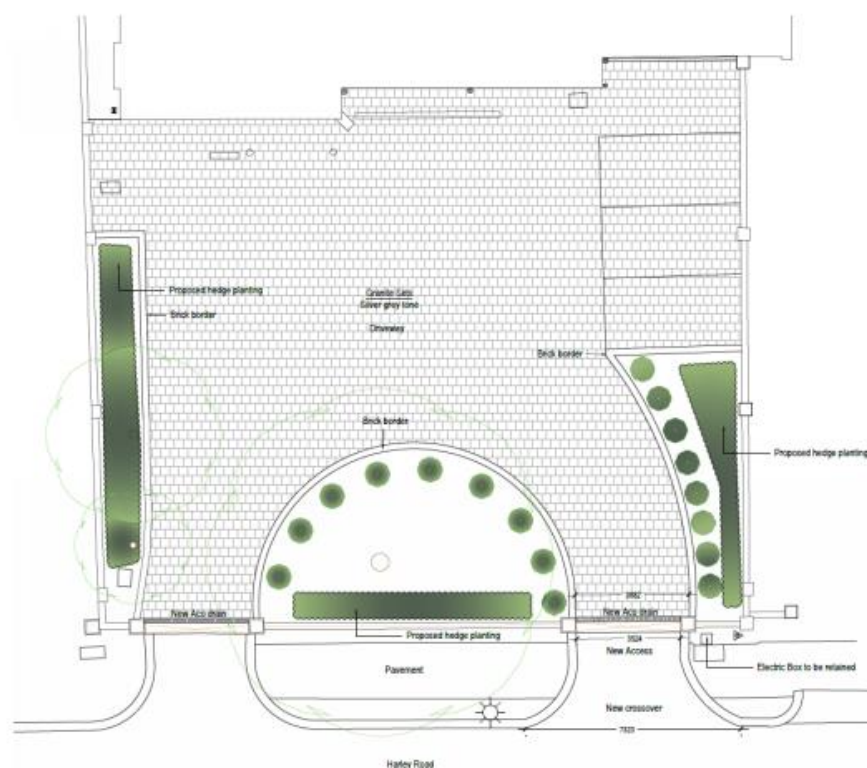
1163-211A_Proposed Driveway and Entrance Plans
